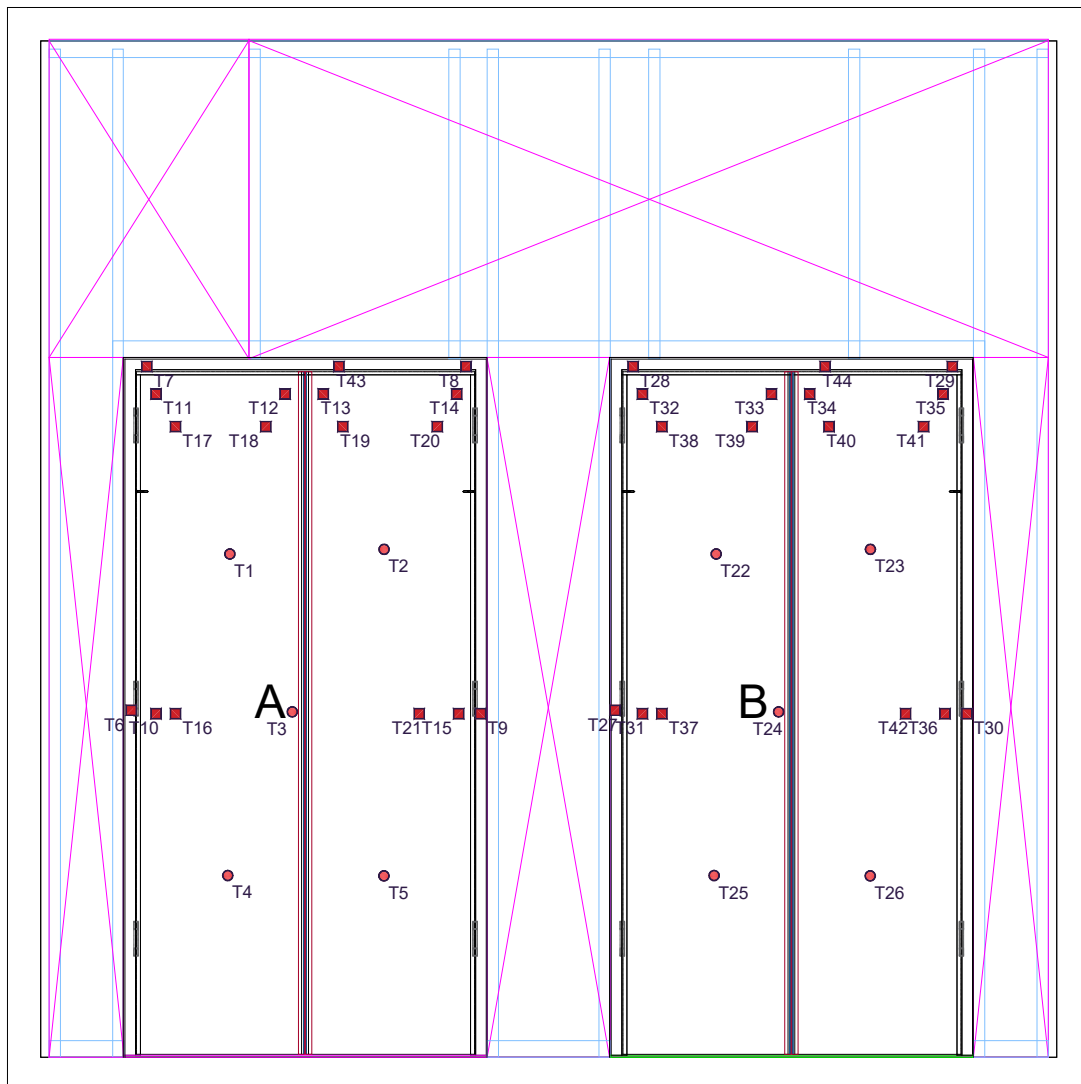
Layout of instrumentation viewed from the unexposed surface of the test construction
